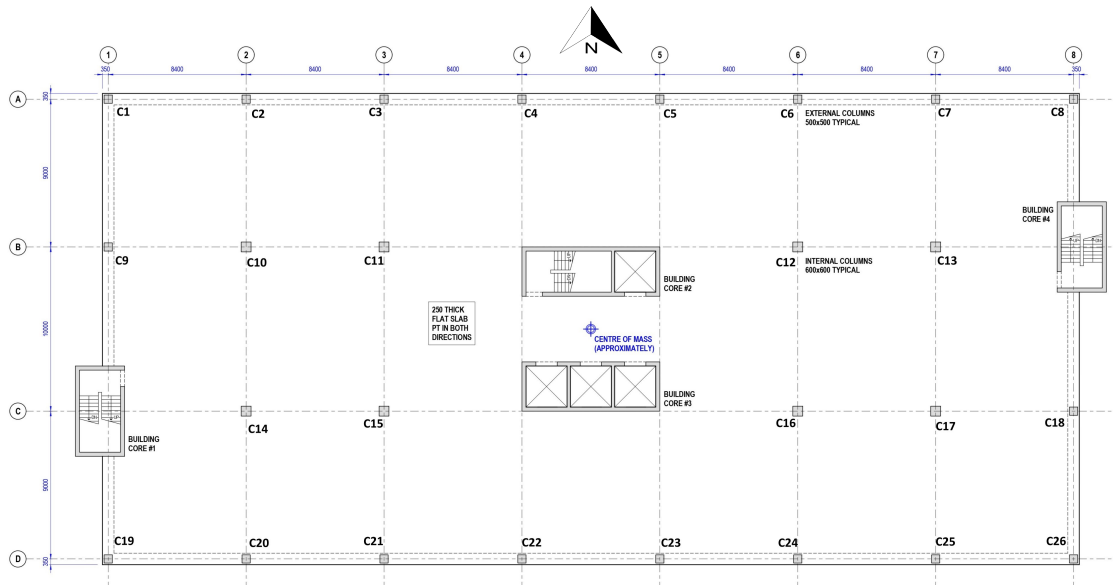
Typical floor framing plan for levels 1 to 8, adapted from the given plan.
